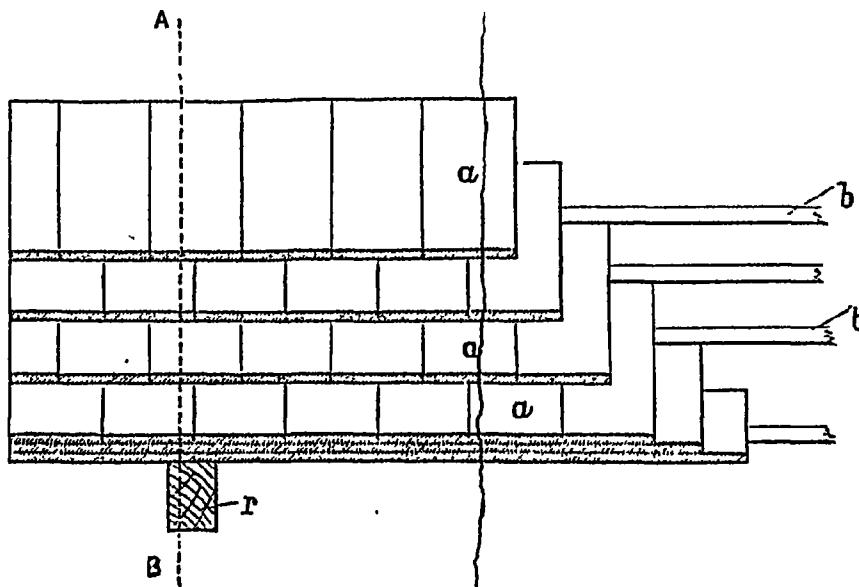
is an elevation of part of a shingled roof. Scale = $\frac{1}{3}$.
